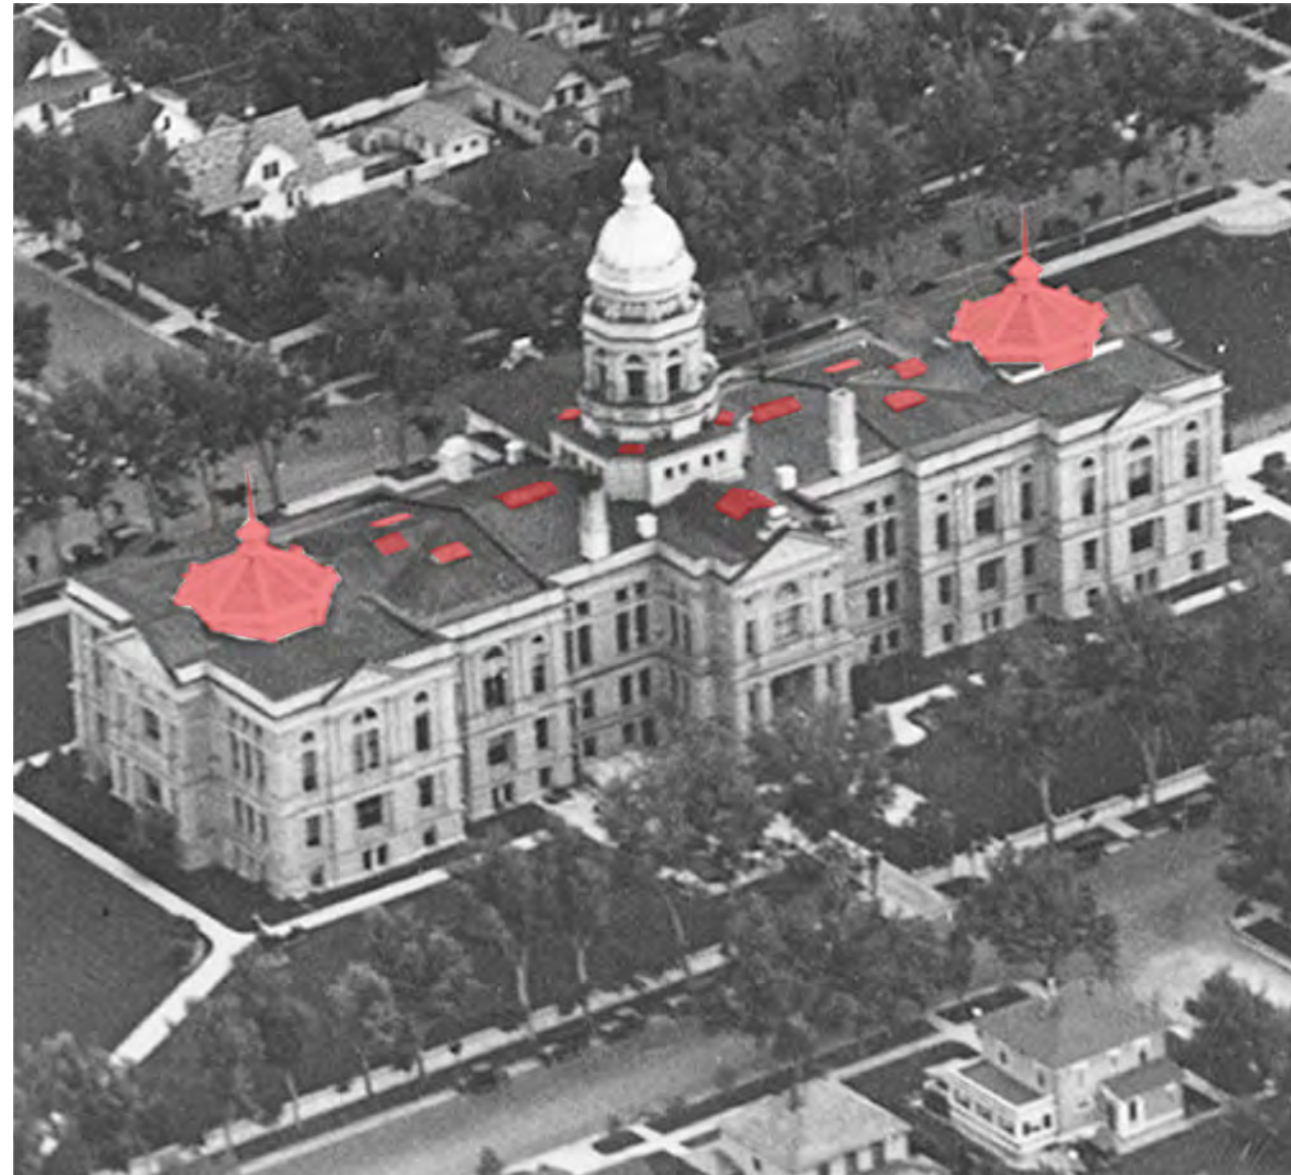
Wyoming State Capitol Building, View of the North Elevation and Roof showing original Skylight locations in red. View looking Southwest, ca. 1930.
